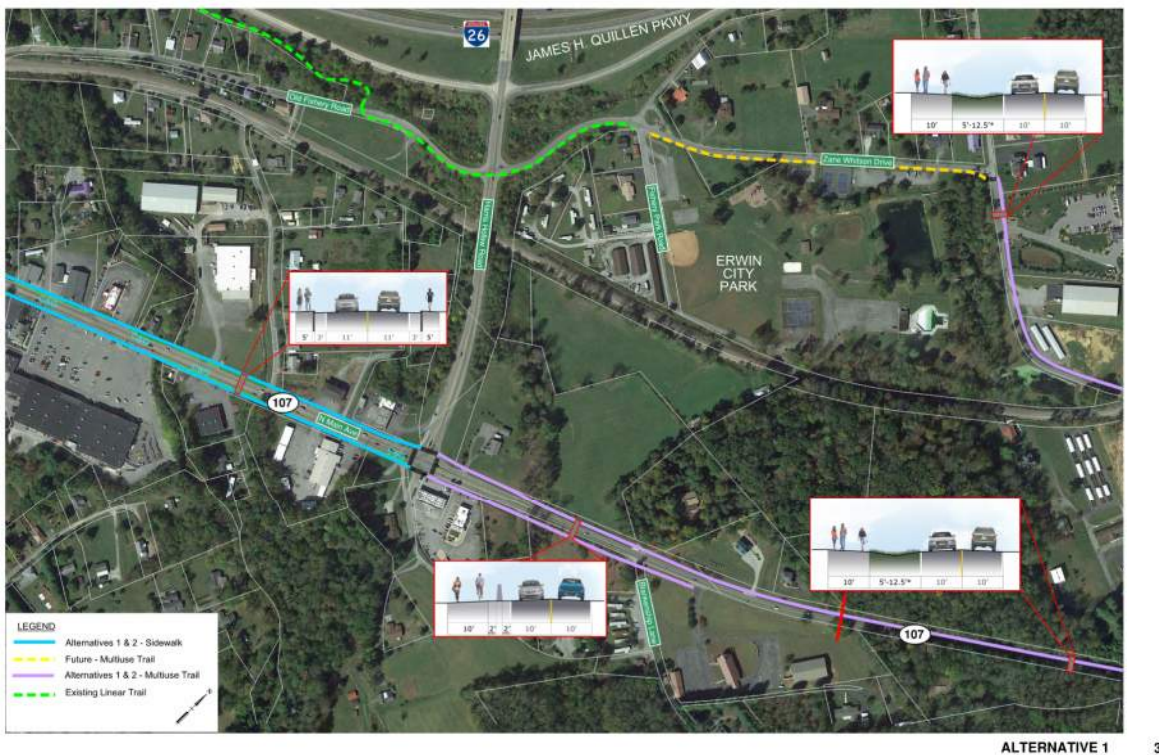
Erwin and Unicoi Recommended Alternatives 1 – Plan Sheets Page 4
